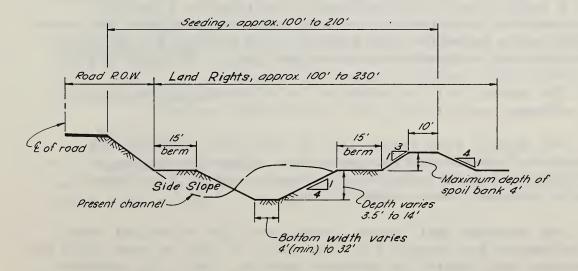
Typical Cross Section of Planned Channel With Adjacent Road
